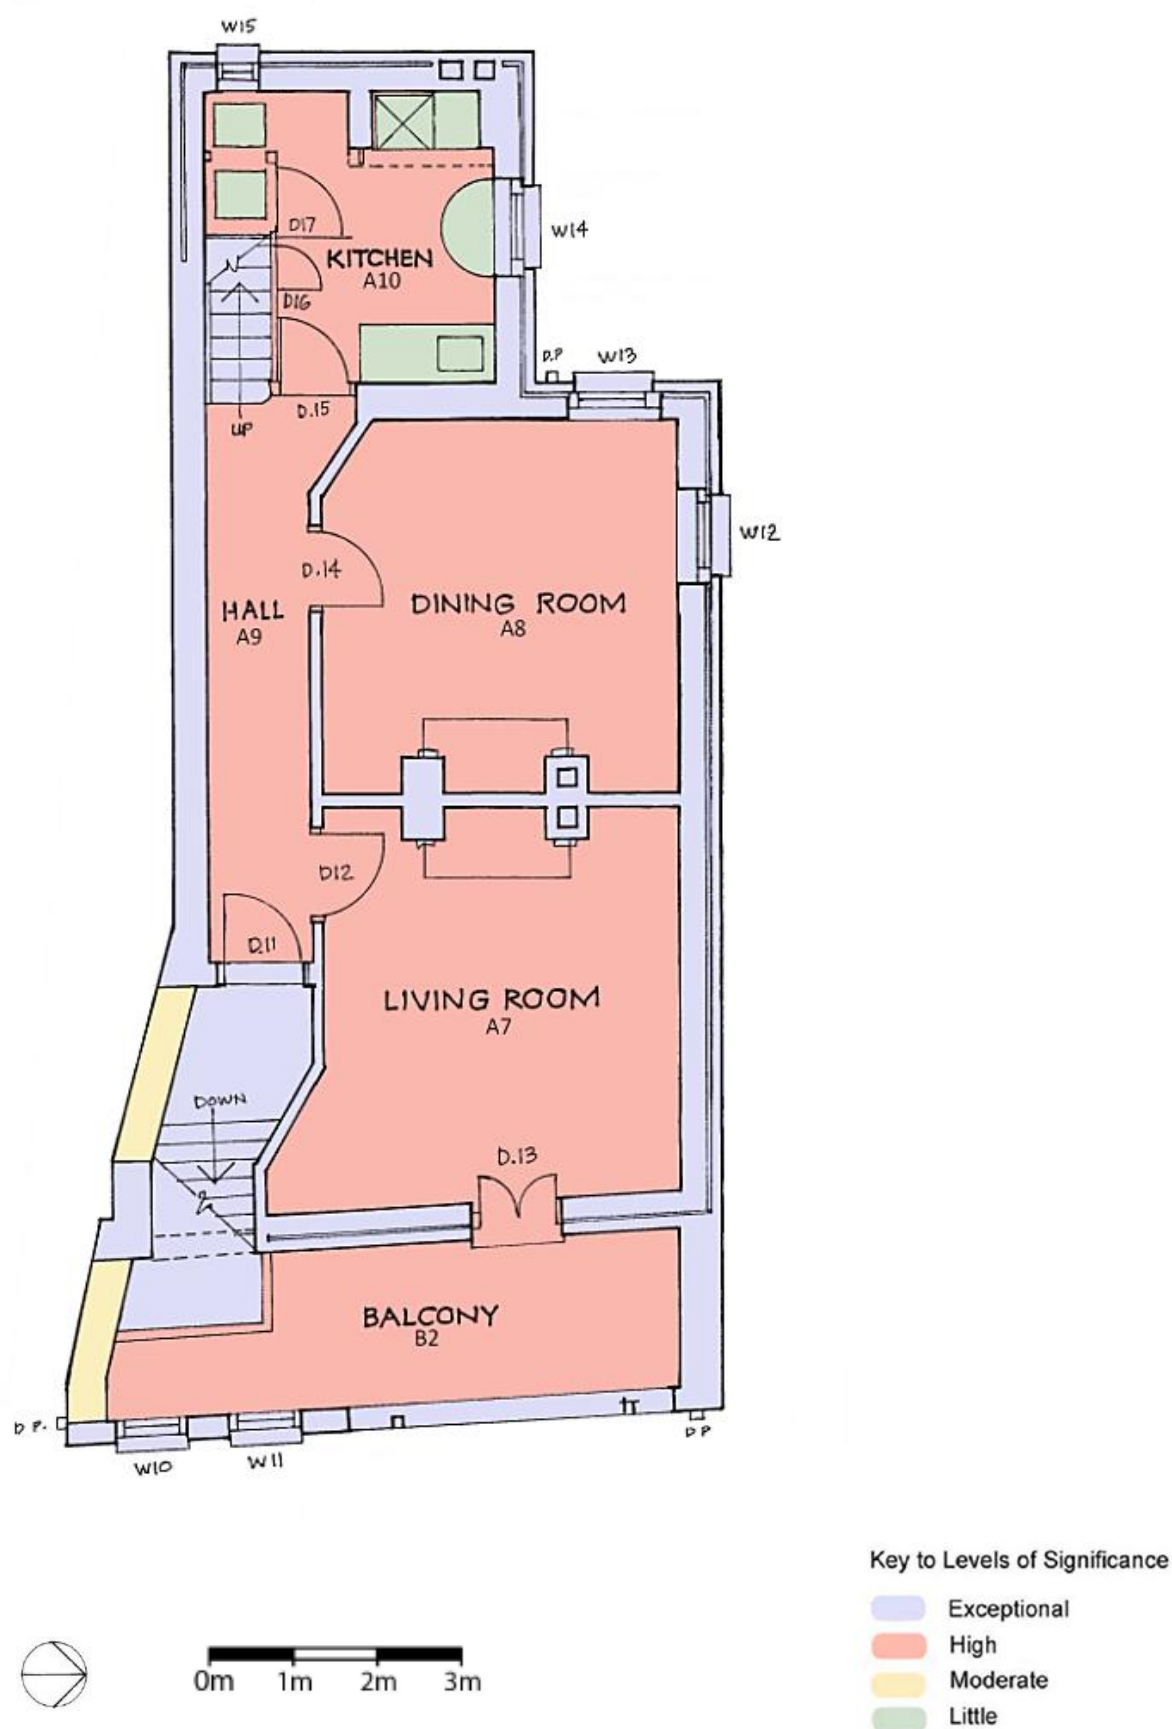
117-117A Gloucester Street – First floor grading of significance
